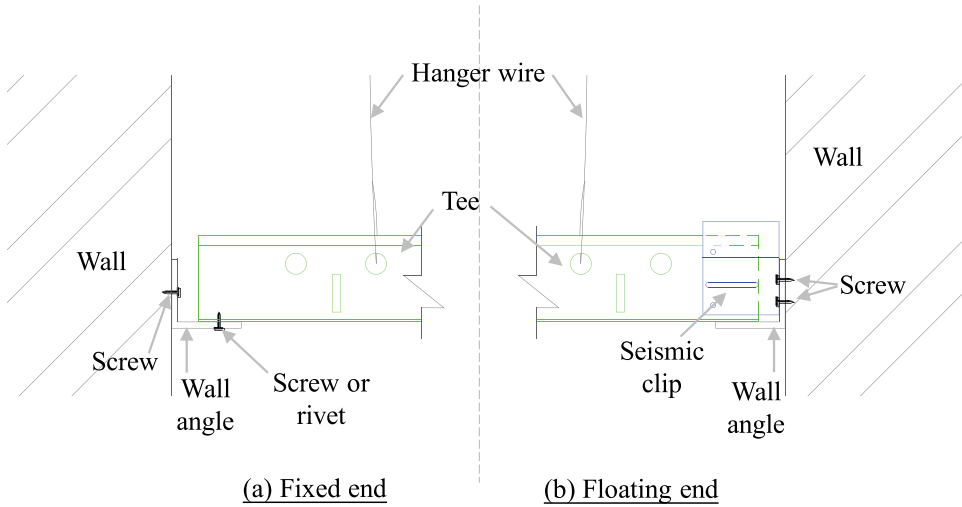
Typical connections between a perimeter-fixed ceiling and the wall.
